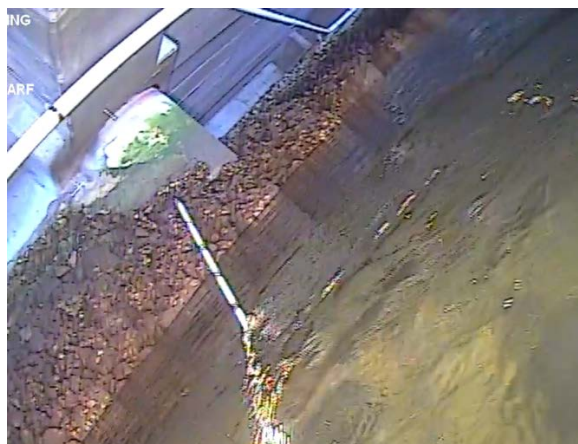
Southern 'D' pile is out of the water behind the sheet piling wall. (Image from T6 (a) Cockle Bay 210705).
